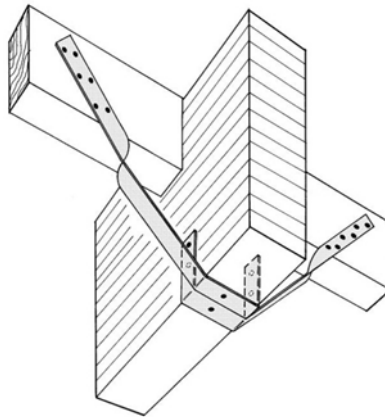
TYPICAL TVB KNEE BRACE INSTALLATION
